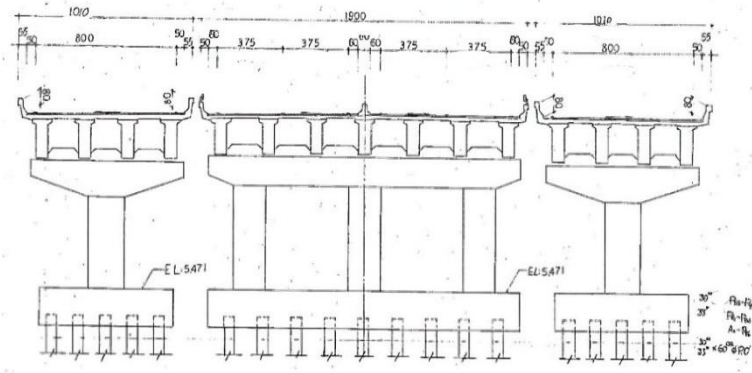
Cross-sectional view of the Shi-Bin bridge.
